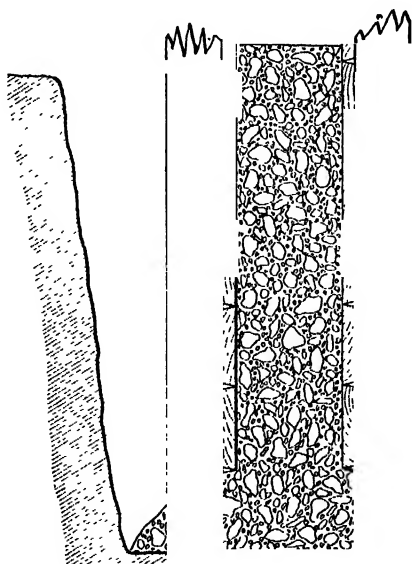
Construction of Form when Base of Wall is Spread. (See p. 19.)
